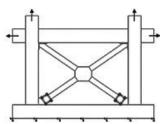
Run Steps, step 1 prestressed force is applied to beam and columns
